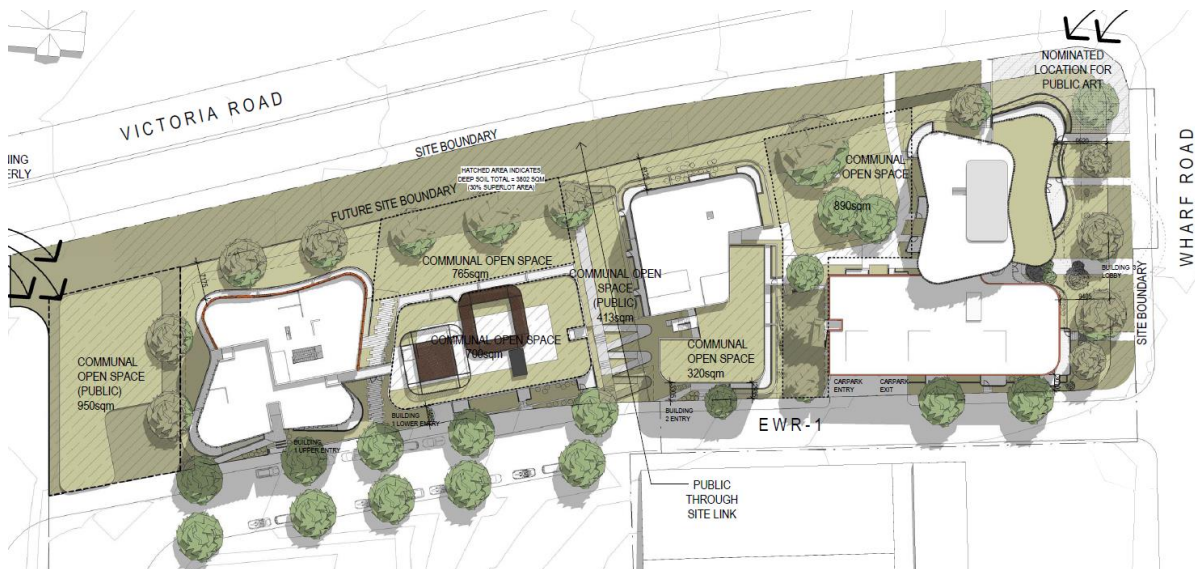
Concept Plan DA/1157/2016 (as proposed to be modified).
